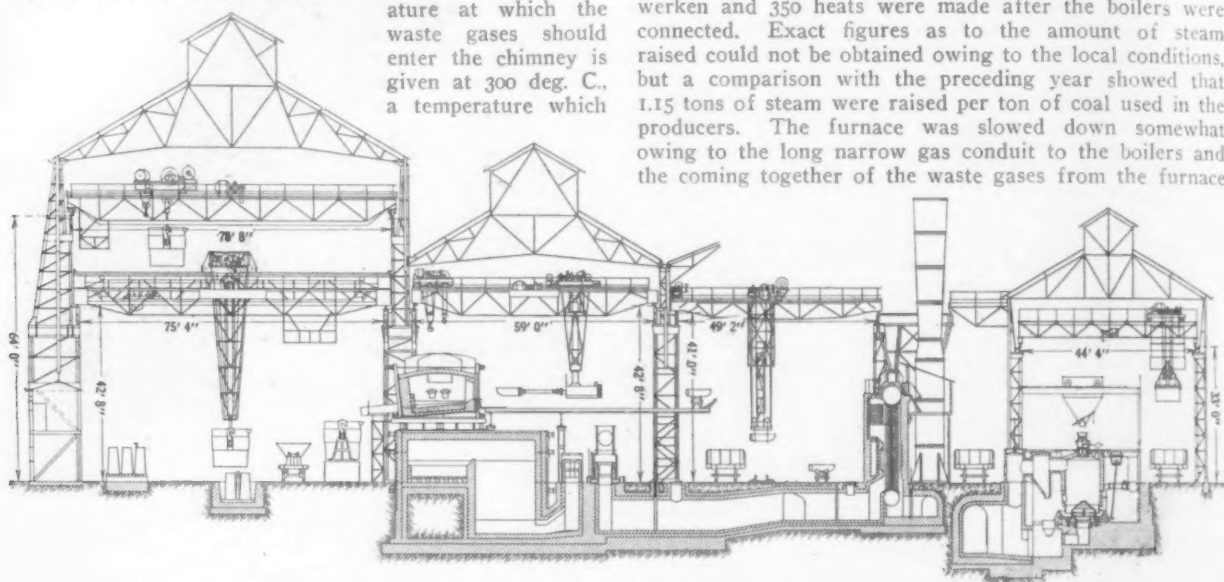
Cross Section of Open Hearth Plant Equipped with Waste Heat Boilers
